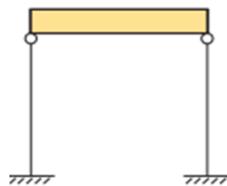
Stability system of the concrete reference frame: Fixed base columns, hinged roof beams
